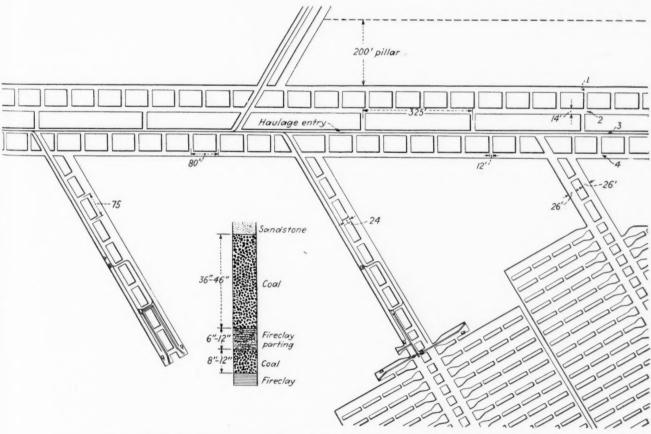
Seam section and general plan for driving entries and working rooms at Winisle.
